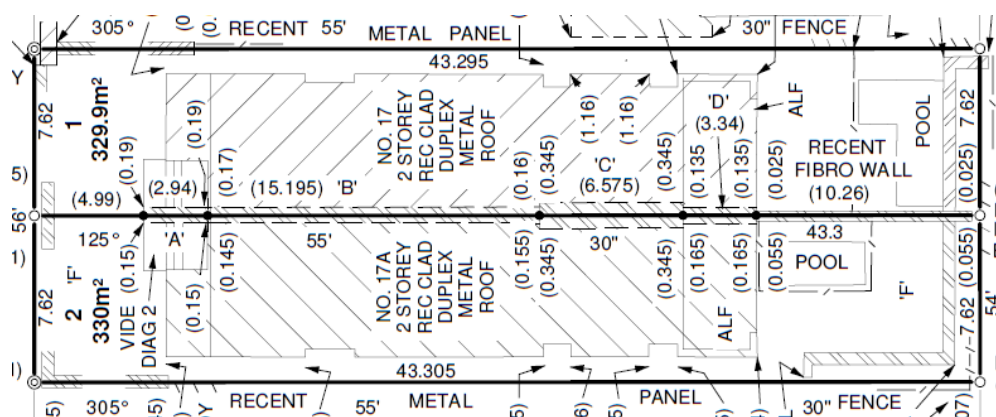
Proposed subdivision plan - 17 Woomera Road, Little Bay (Source: Ian Wicks)
